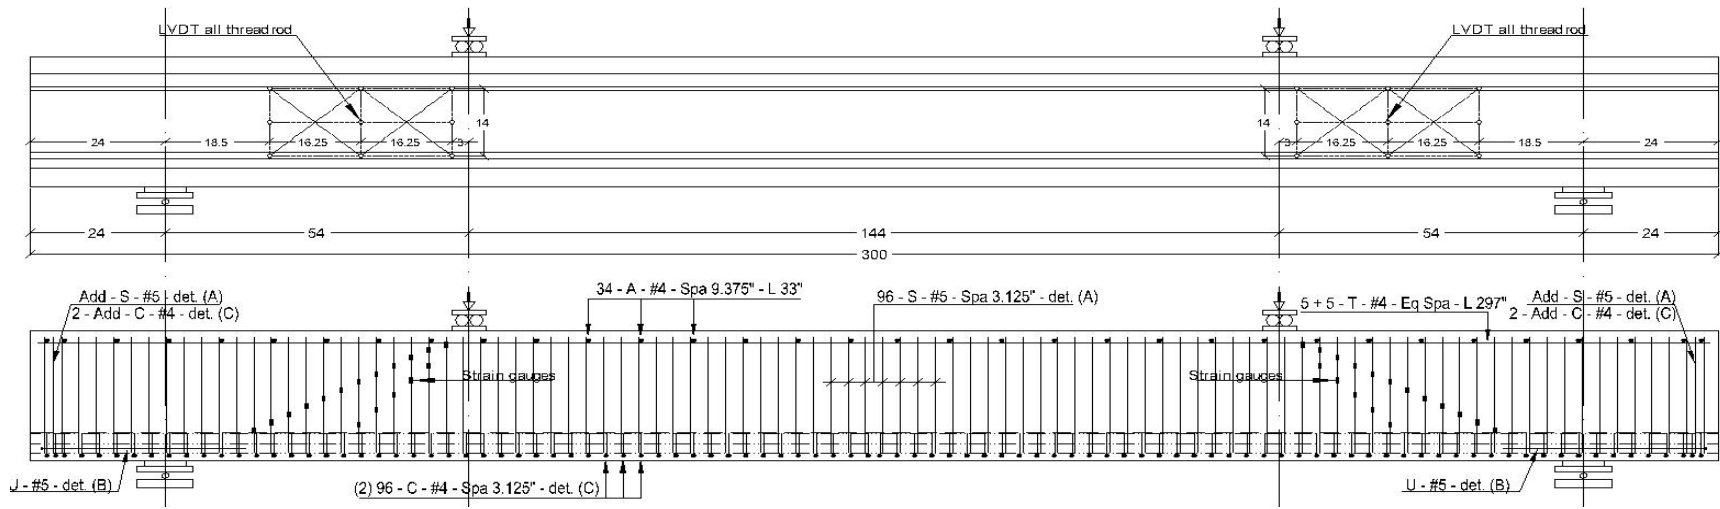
Detailed Longitudinal Cross-Section for Girder F2
